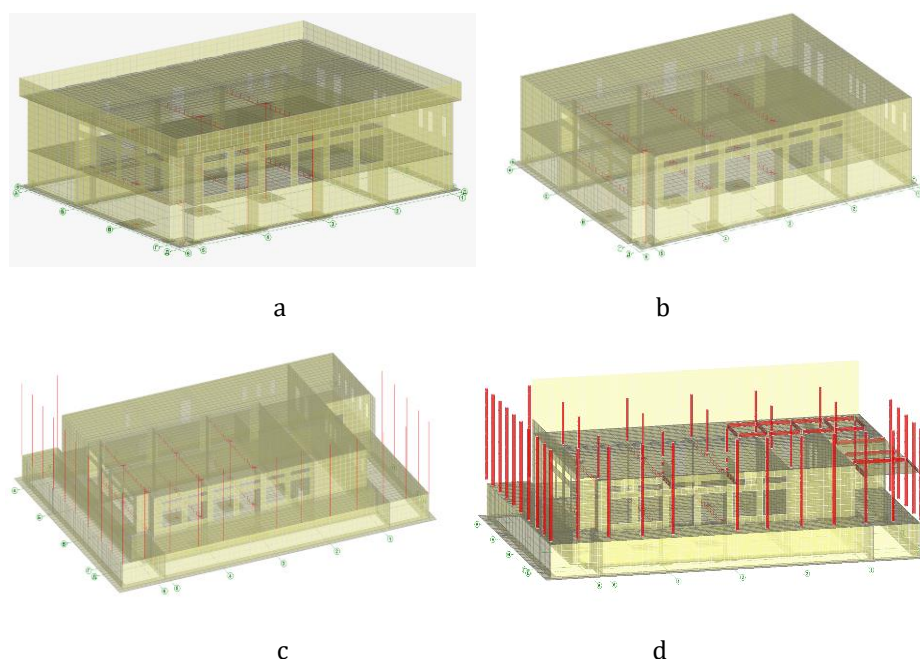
FEM analysis schemes for separate stages of the reconstruction project of a one-storey building with its extension and superstructure: a - before reconstruction; b - during demolition of structures; c - during reinforcement of the ground floor columns and installation of columns on foundations of extension; d - during installation of the second-floor columns and floor beams.
